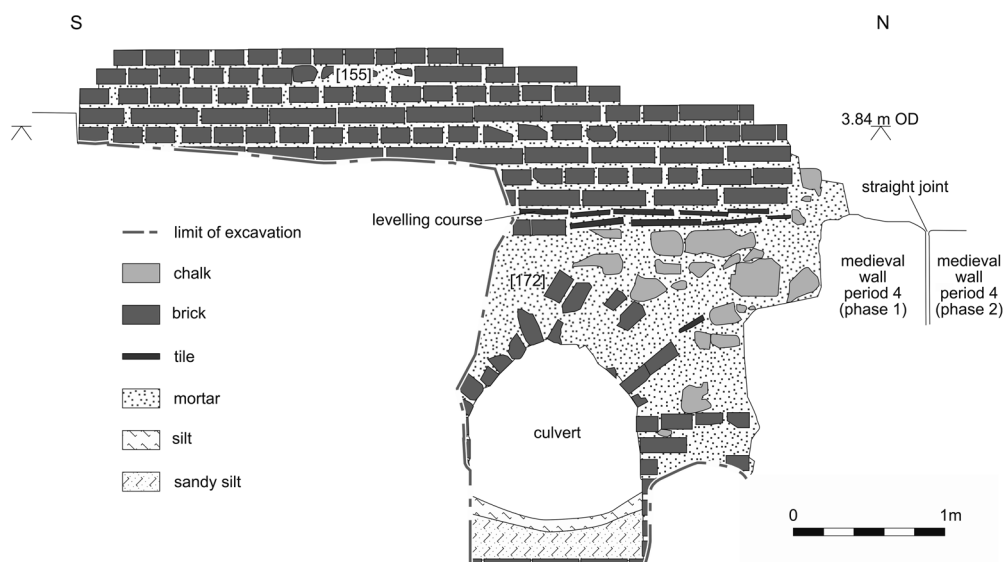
Elevation of the modified east side of the gatehouse (scale 1:50)
